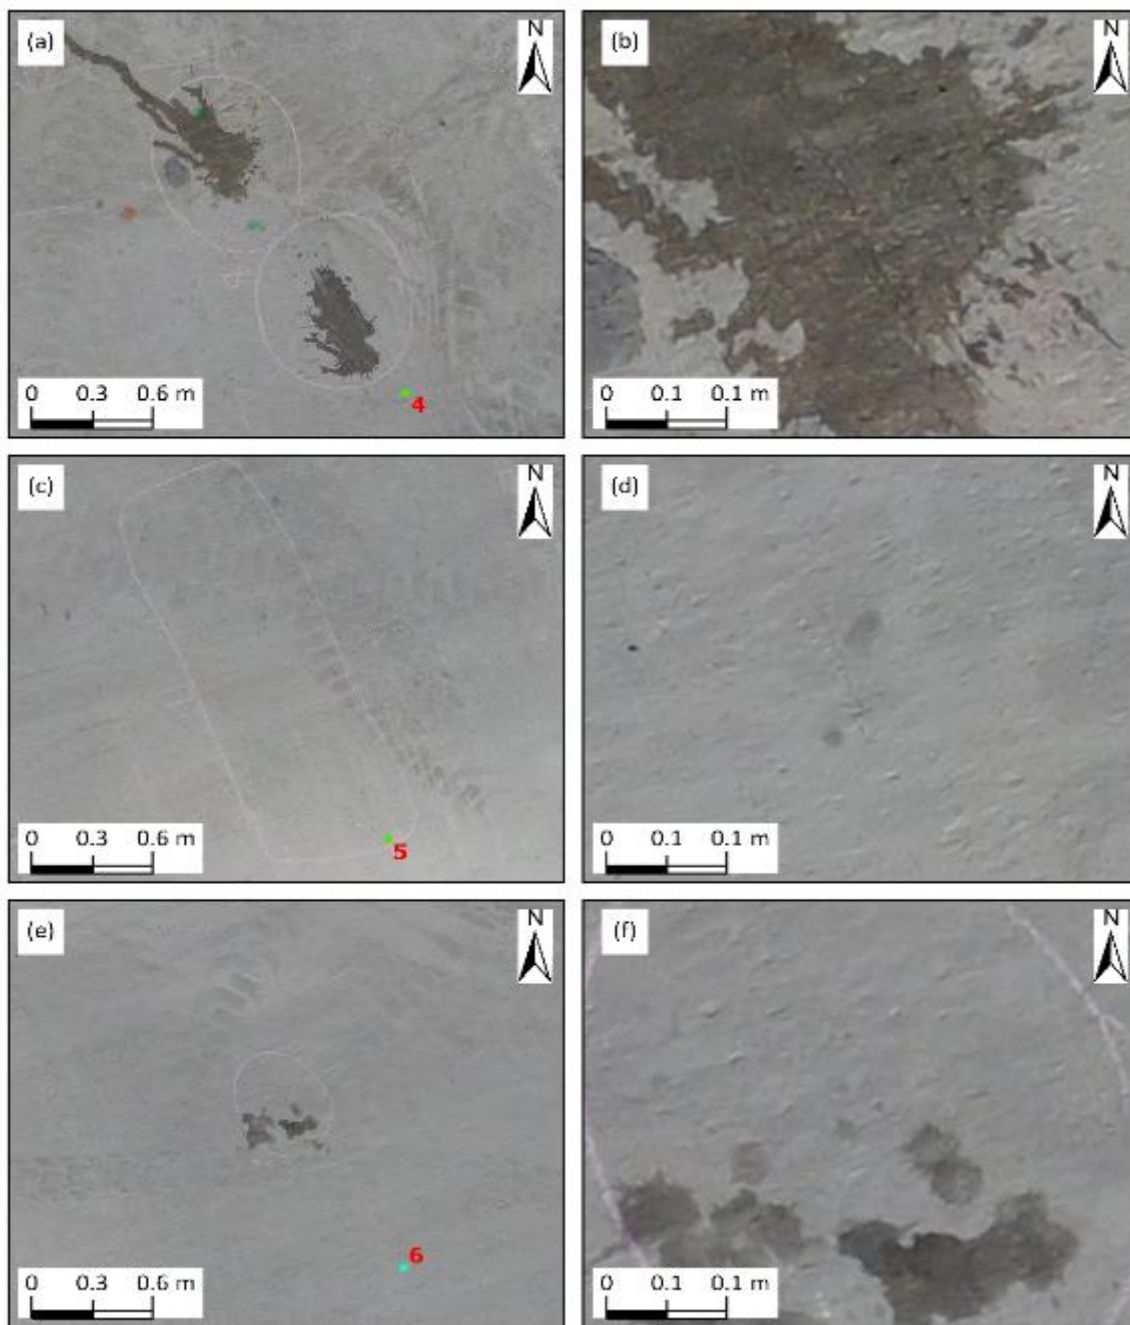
Cracks 4 through 6 at 0.032 in. (0.81 mm) GSD (1:30 zoom level on left and 1:5 zoom level on right)
